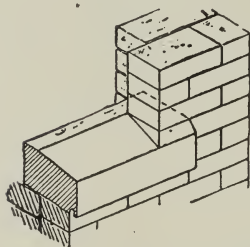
Stone Lug Sill Showing Flat Ends, Wash and Drip.
